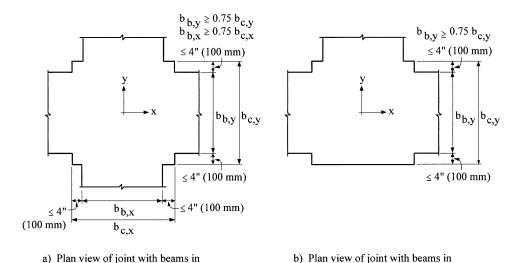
Definition of adequate lateral confining members for evaluating joint transverse reinforcement.
